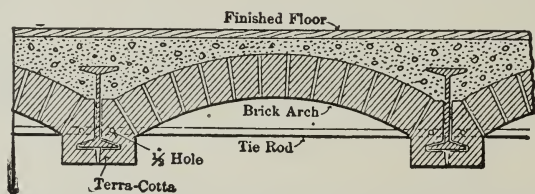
Brick Floor Arch with Beam Flange Covering.
